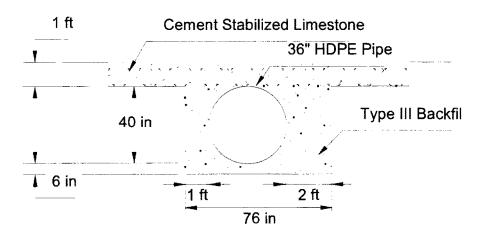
Cross-Section of Installation Y1 in Yoakum District.
